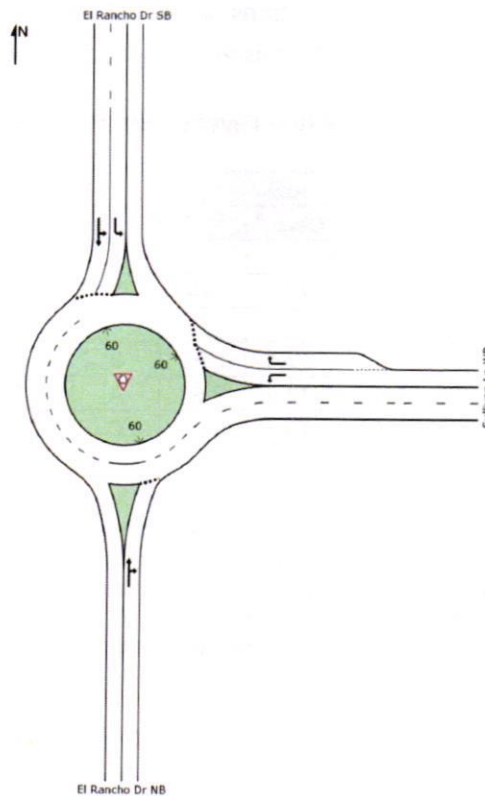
Proposed Roundabout Configuration – El Rancho Drive/Sullivan Lane
